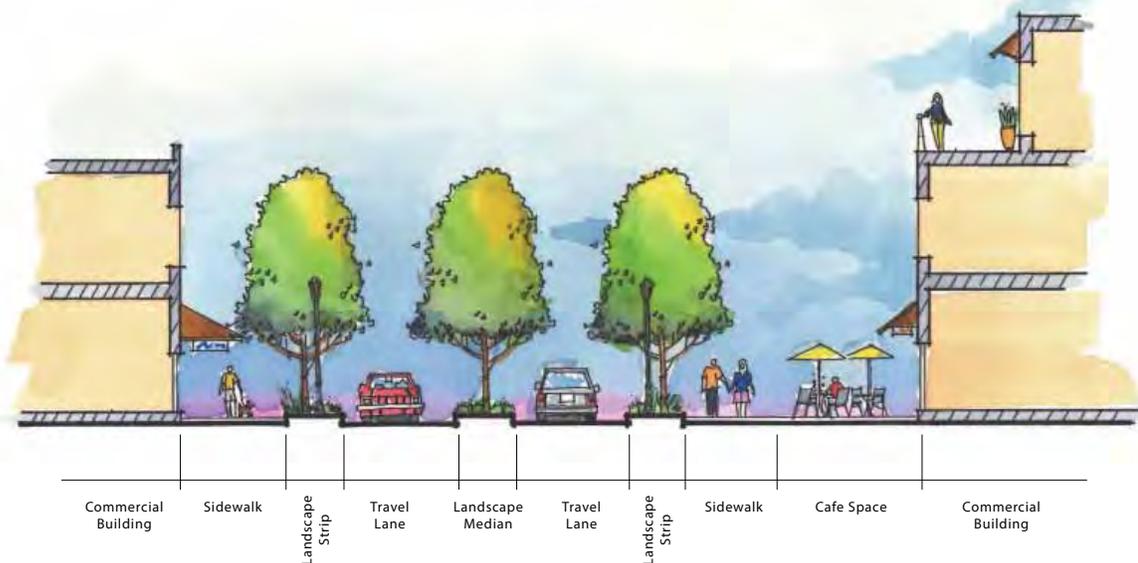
Downtown Sub-Area/Roadway Cross Section
